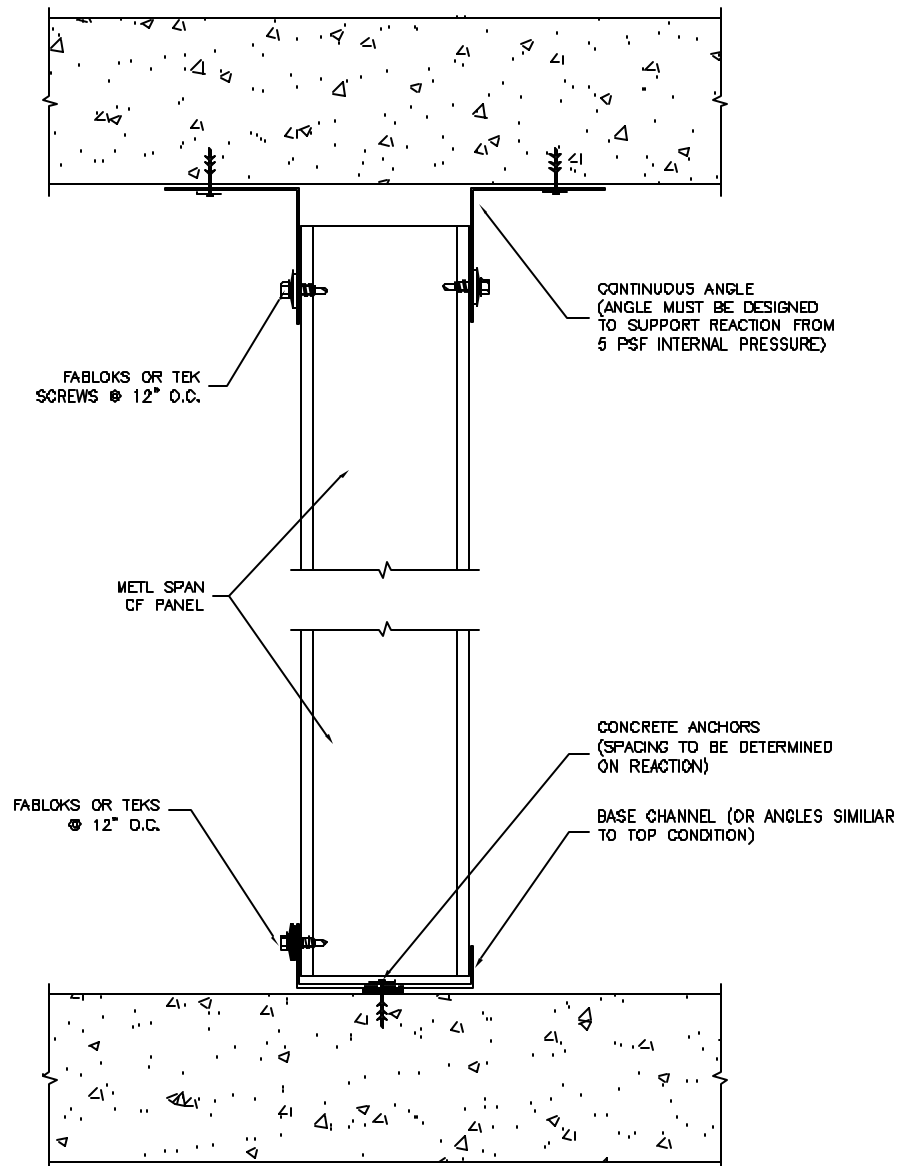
TYPICAL PANEL END CONNECTION DETAILS
